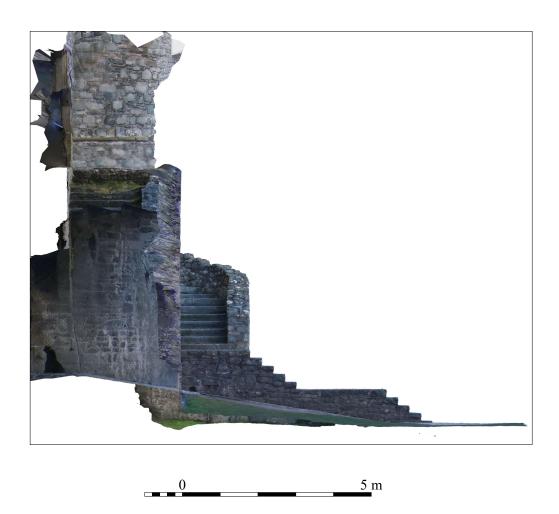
Photogrammetric Elevation of the Existing Steps Scale 1:100
